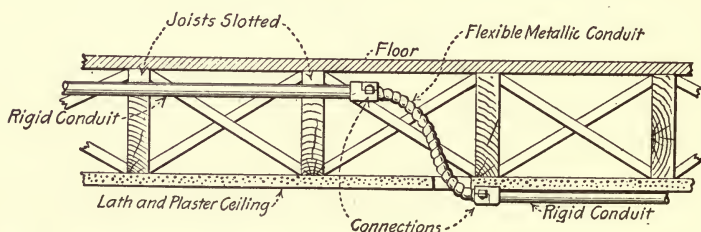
Using flexible metallic conduit instead of a double elbow to connect two lengths of rigid conduit.
